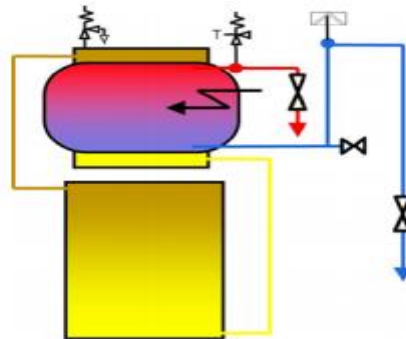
Hydraulic scheme of the thermosiphon system installed at house A (13)
